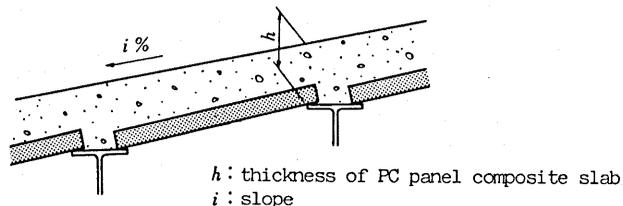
Thickness of prestressed concrete panel composite slab in case a gradient exists
